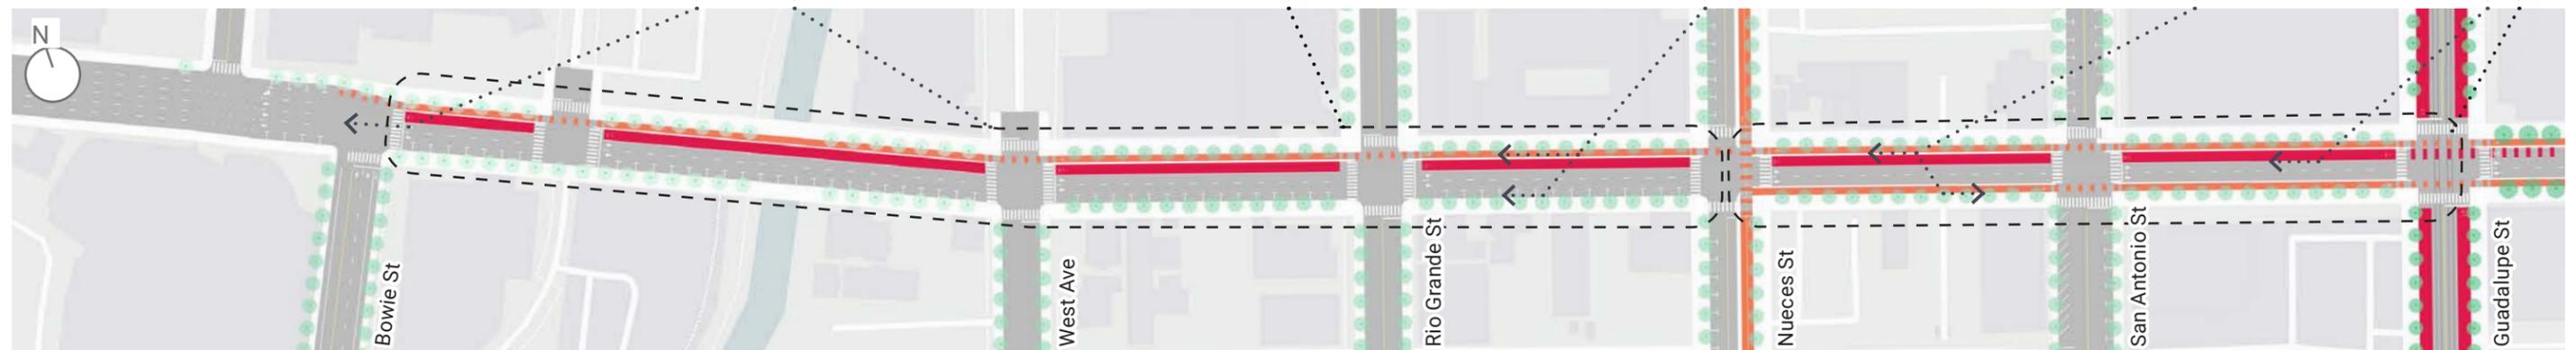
Sixth Street schematic Guadalupe Street to Bowie Street
